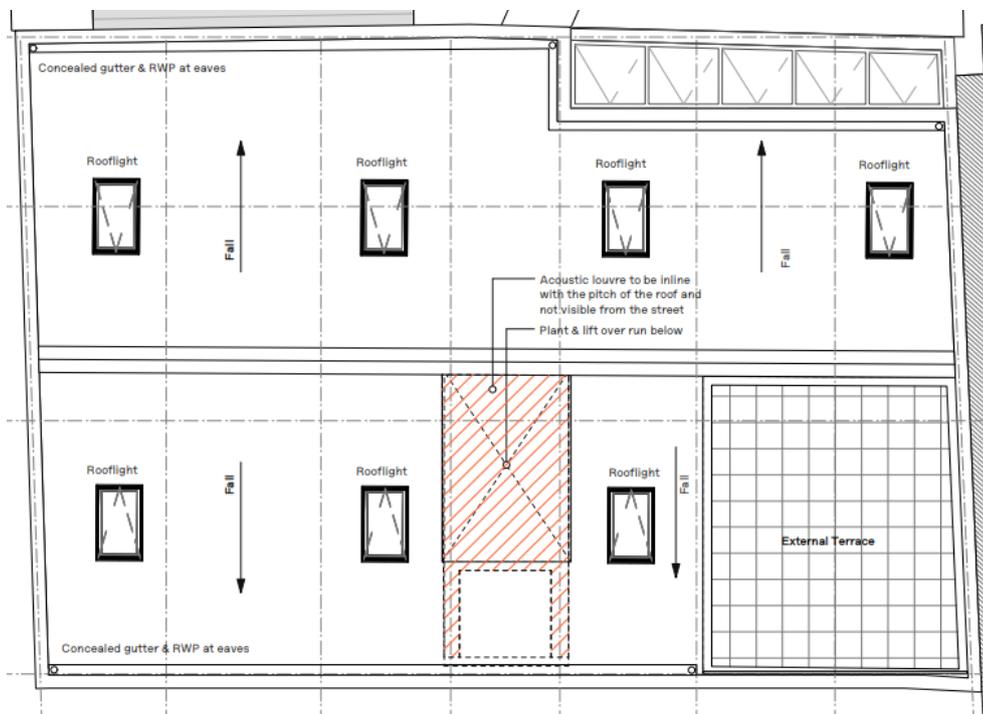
Proposed roof plan with roof terrace and louvers for plant equipment
